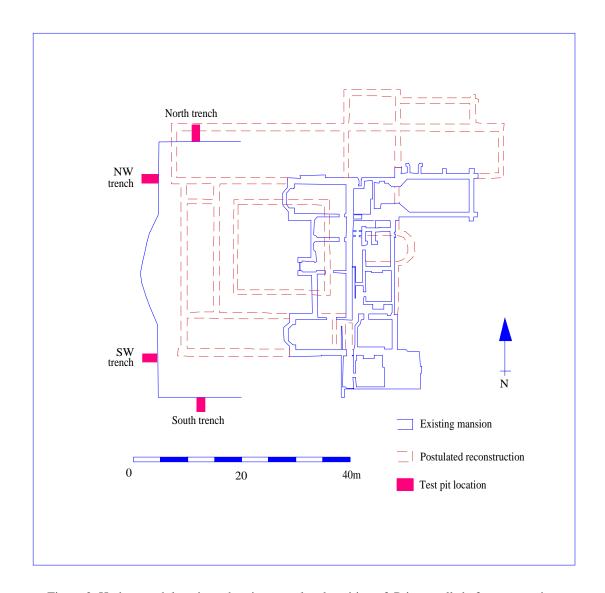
Ha-ha trench locations showing postulated position of Priory walls before excavation.
